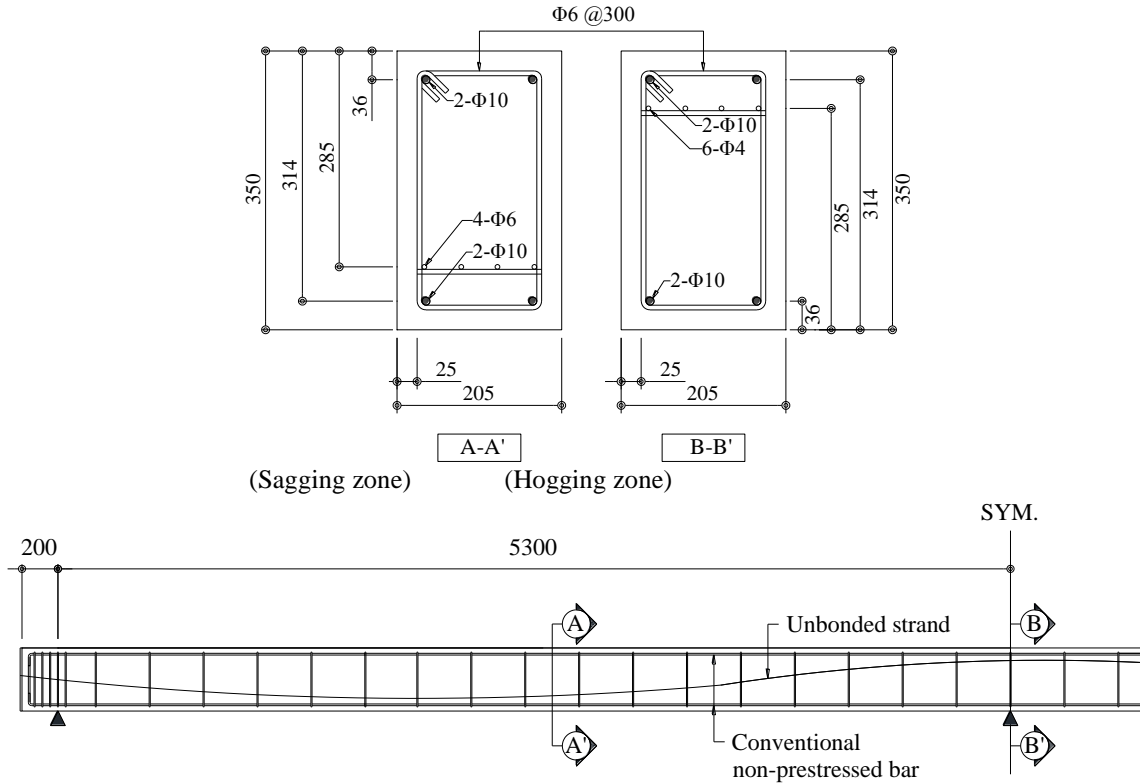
Details of specimen geometry and arrangement of reinforcement
